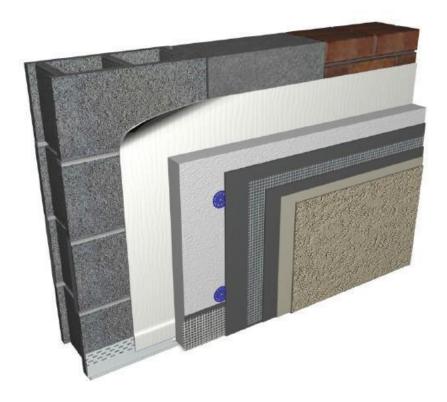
"InsulROCK EIFS" over modified bituminous membrane on masonry, concrete, and brick
